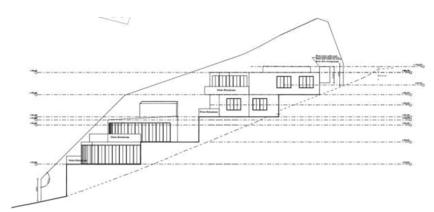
northern elevation of the proposed dwellings at 18 Ascot Avenue.
